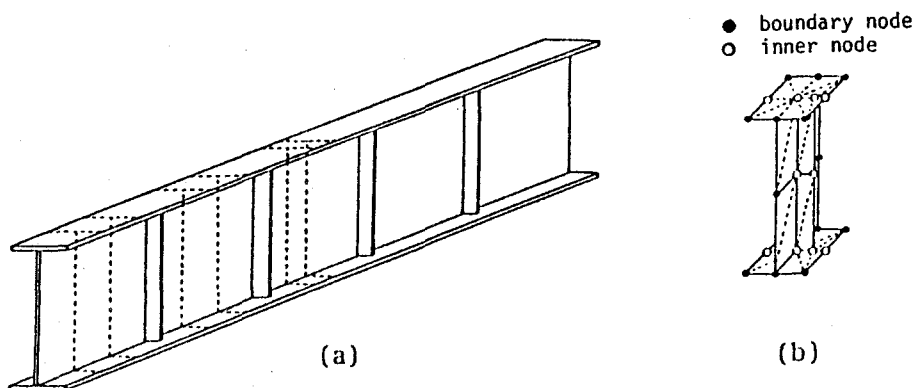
I-Section Plate Girder with Vertical Stiffeners
